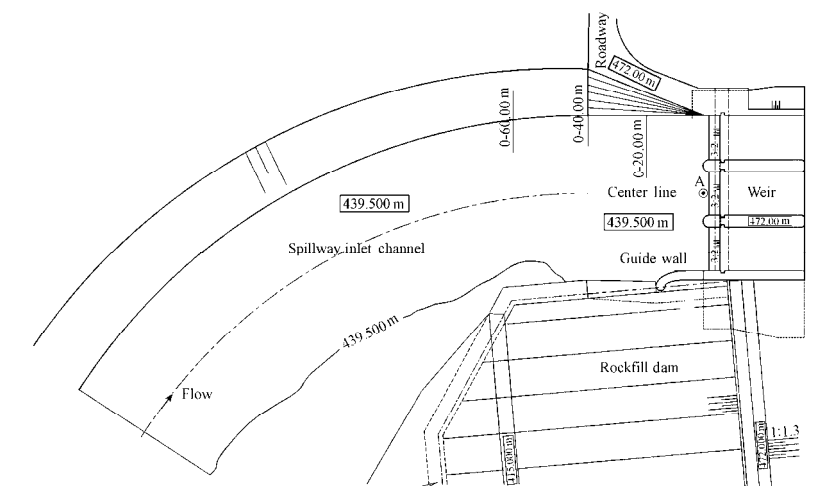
Layout of inlet channel for bank spillway of Yutang Project
